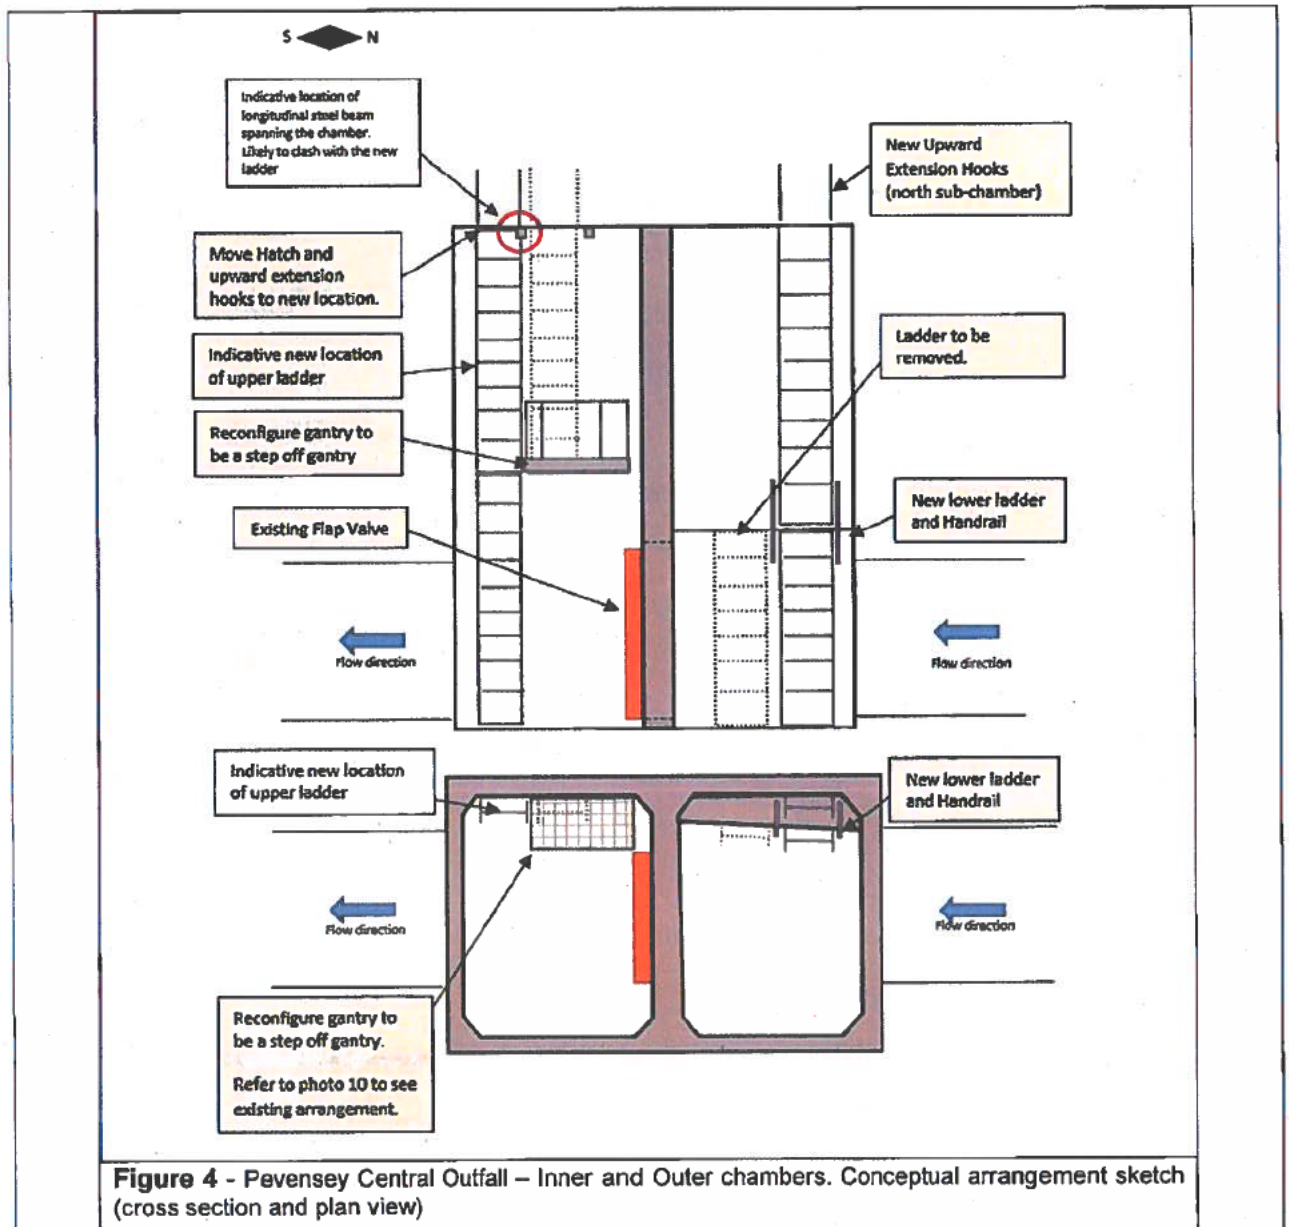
Pevensey Central Outfall – Inner and Outer chambers. Conceptual arrangement sketch (cross section and plan view)
